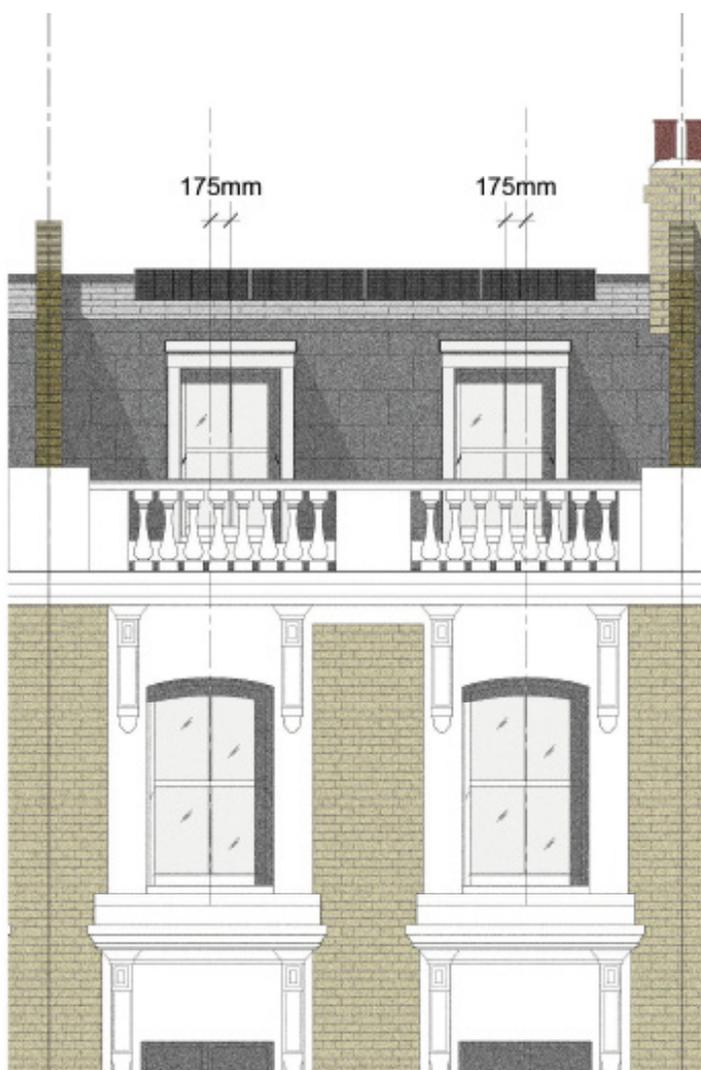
Proposed mansard elevation showing alignment with existing windows below
